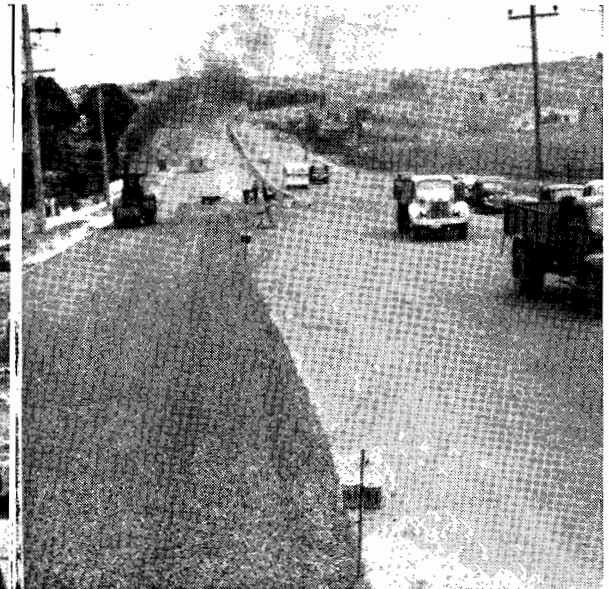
Reconstruction and widening in progress to form divided road, Warrigal Road, Holmsglen.
